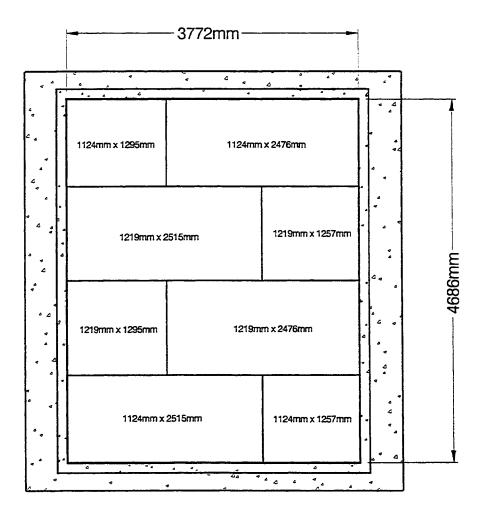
Face layer gypsum board layout, resilient metal channels 406 mm o.c.
